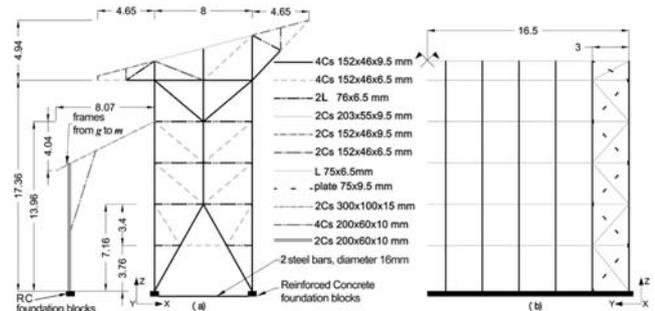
Structure 1; front view (a) and side view (b), dimensions in meters.
